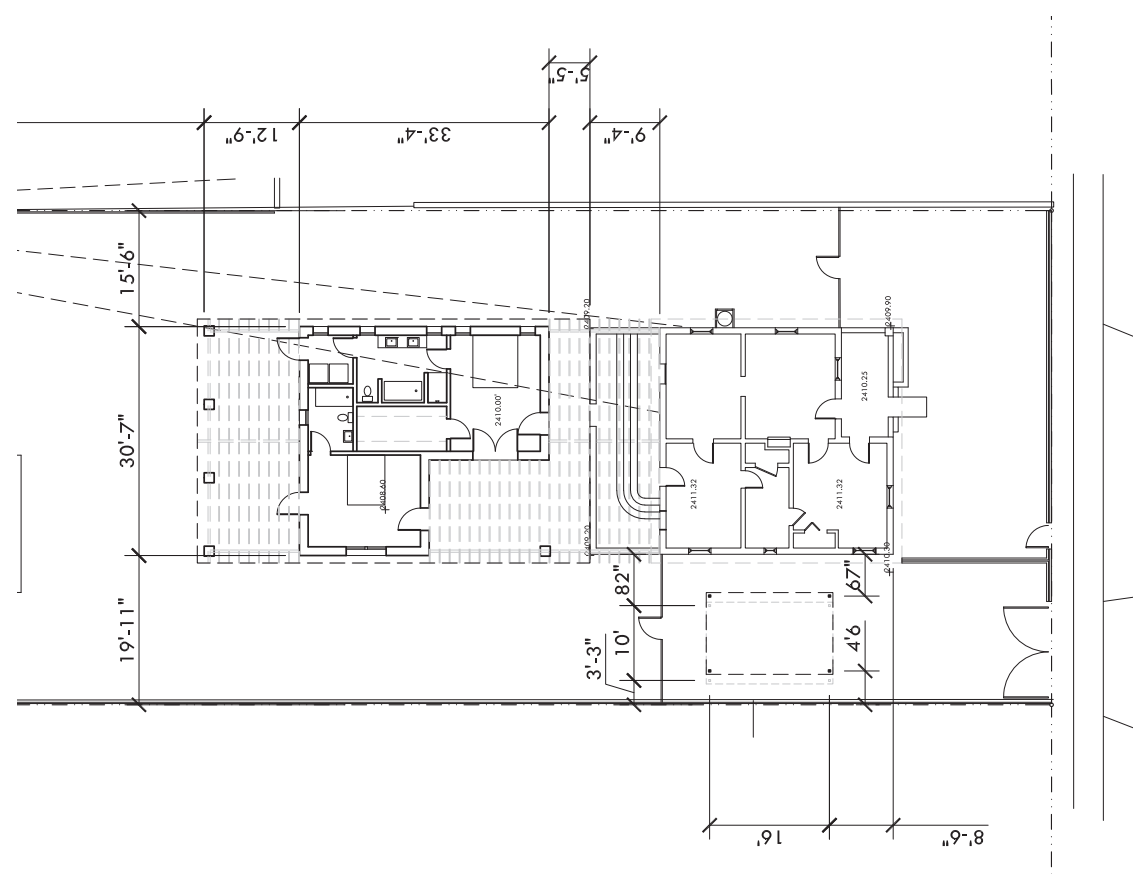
FIGURE GROUND EXISTING - REVISION IS ADDING 827 S ARIZONA AVENUE
